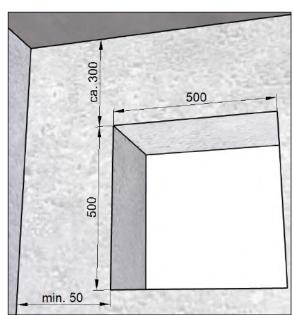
Wall breakthrough for installation kit with filler piece, dimensions in millimetres
